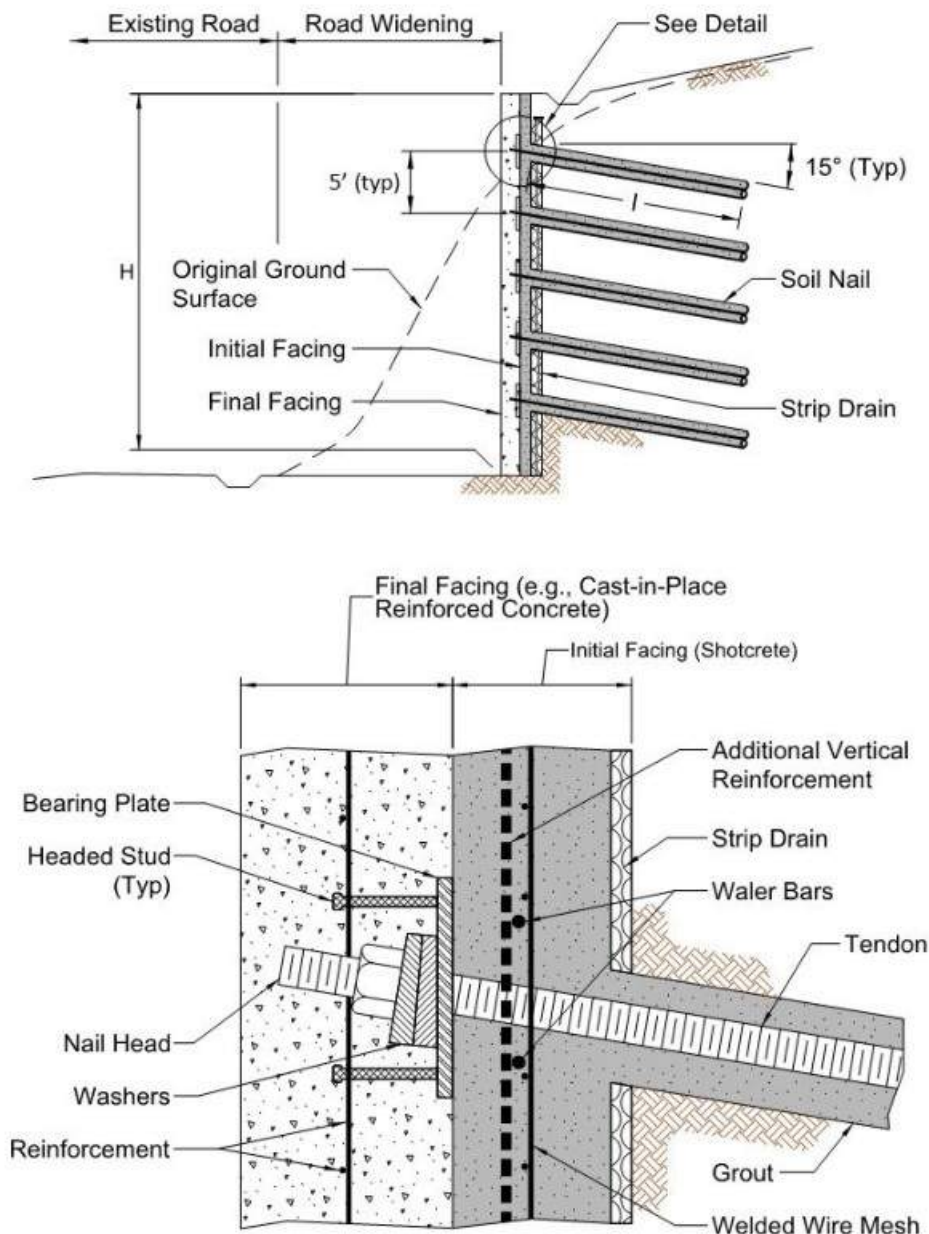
Typical Cross-Section of a Soil Nail Wall: (a) Overall Cross-Section, and (b) Nail Head Detail. (Lazarte et al., 2015, after Porterfield et al., 1994)
